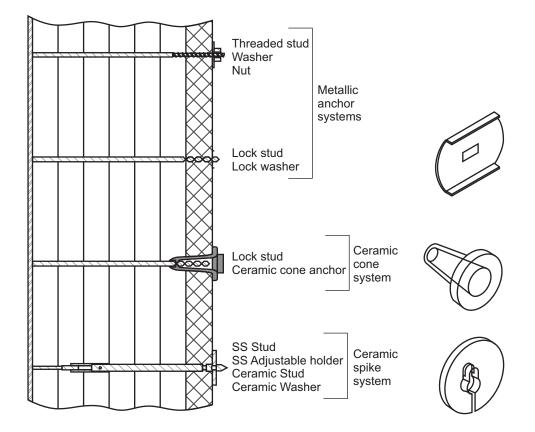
Typical Layered Fiber Lining Anchoring Systems
